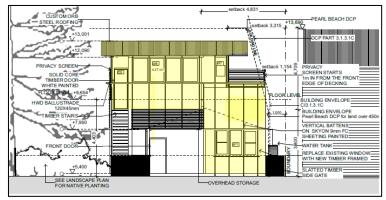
South Elevation (street frontage) original proposal referred to the Panel for determination (yellow highlight shows the additions to the existing dwelling)
